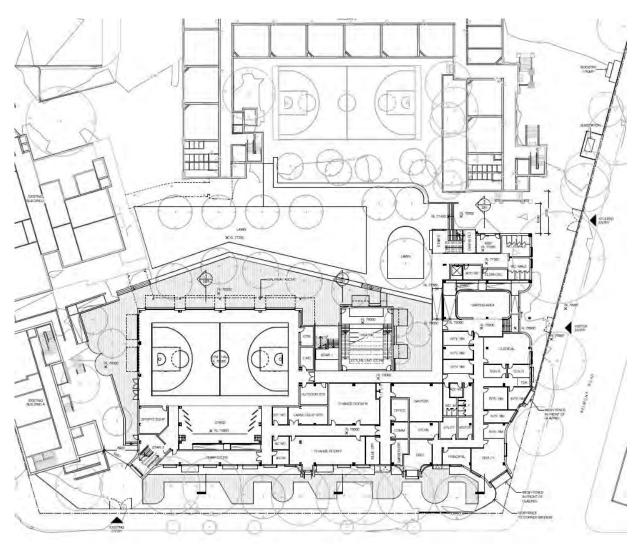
Proposed SSDA site layout (Source: Multiplex)
